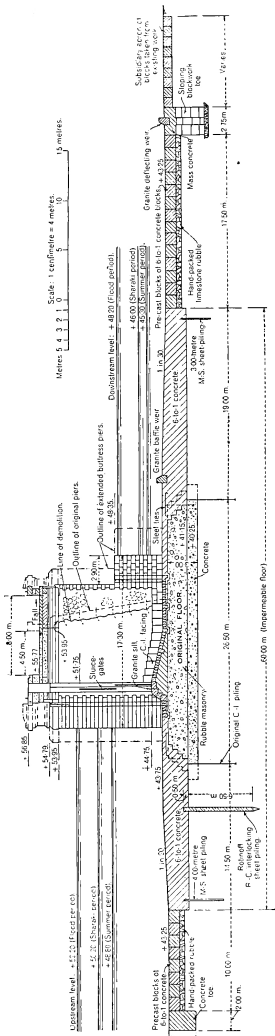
RECONSTRUCTION OF THE ASSIUT BARRAGE, SHOWING SUDD.
